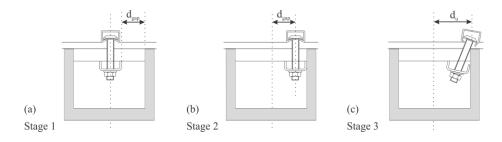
The behaviour mechanism of the top bolted connections: (a) initial position, (b) the contact of the connection parts, and (c) the failure of the connection
